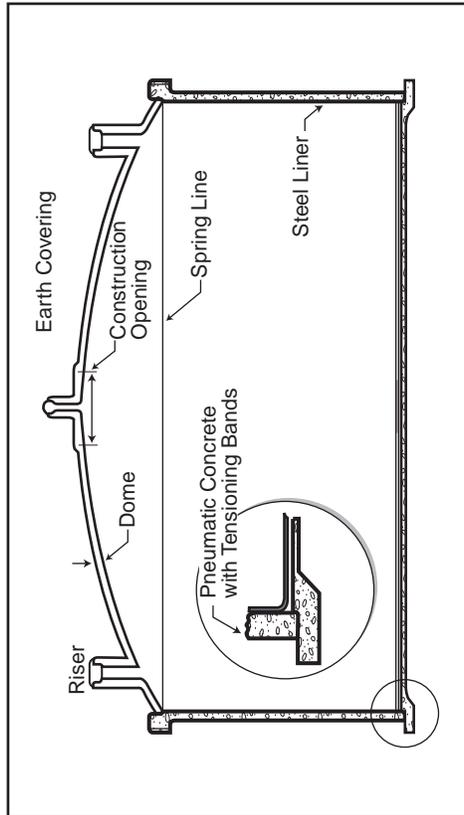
C. Uncooled Waste Storage Tank, Type IV (Prestressed concrete walls)
